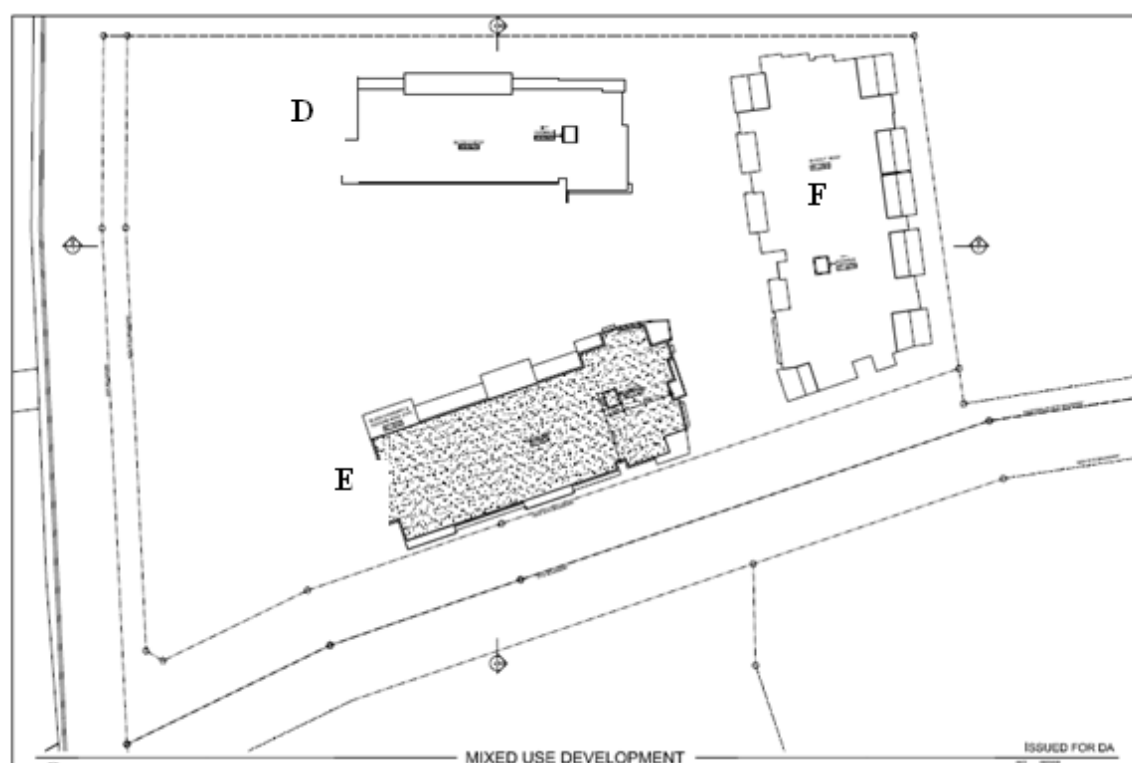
Roof Plan of Buildings D, E and F – source Krikis, Tayler Architects.
